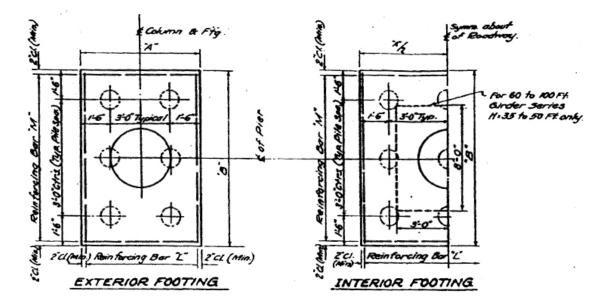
Bridge 5/227 Intermediate Bent Footings
